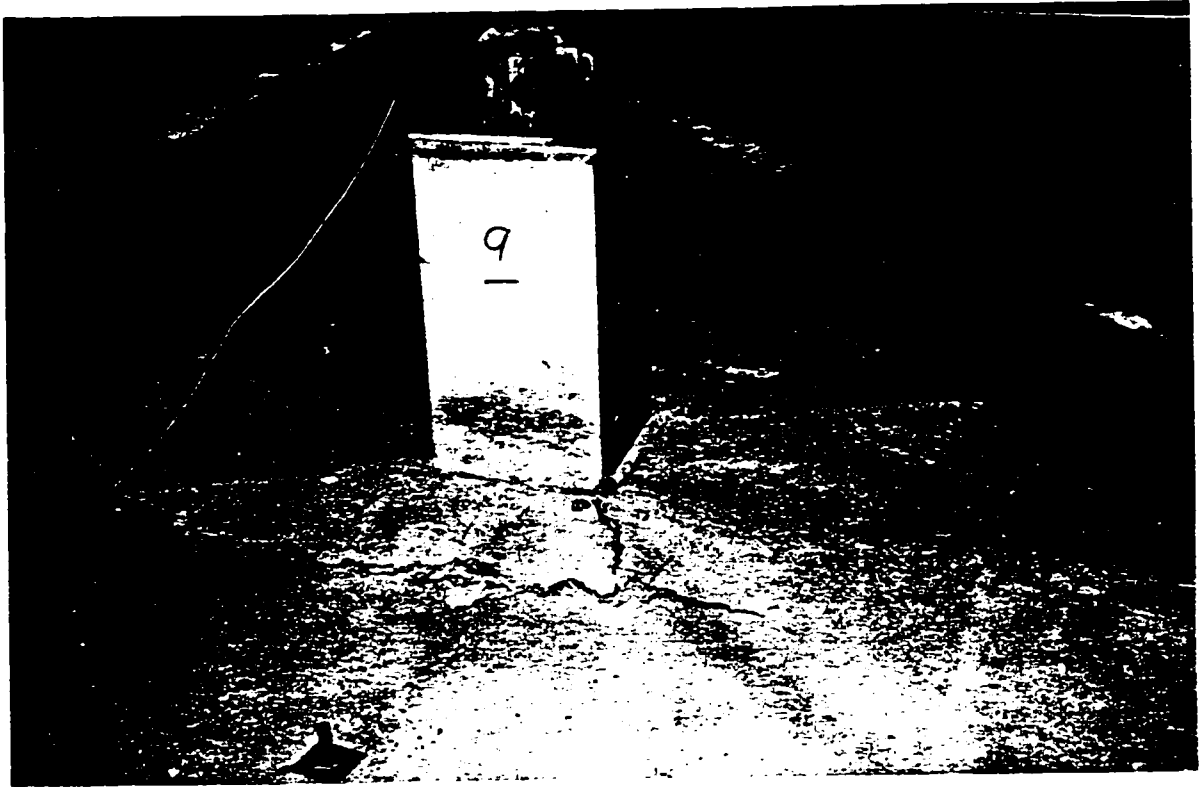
The punching shear failure around column 9 in Test no. 5
